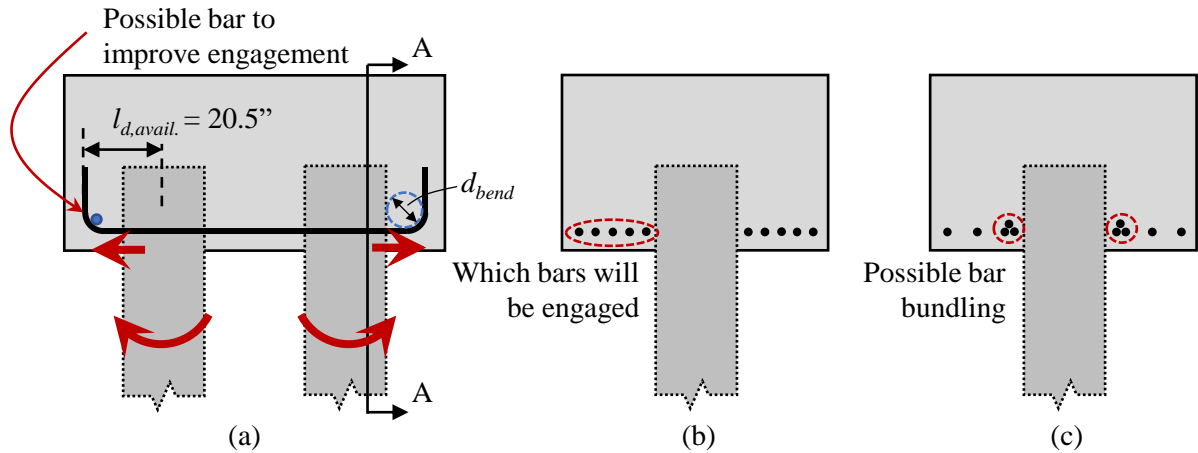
(a) Engagement of longitudinal reinforcement around pile, (b) cross section of typical longitudinal reinforcement, and (c) cross section with possible bar bundling if reinforcement engagement does control
